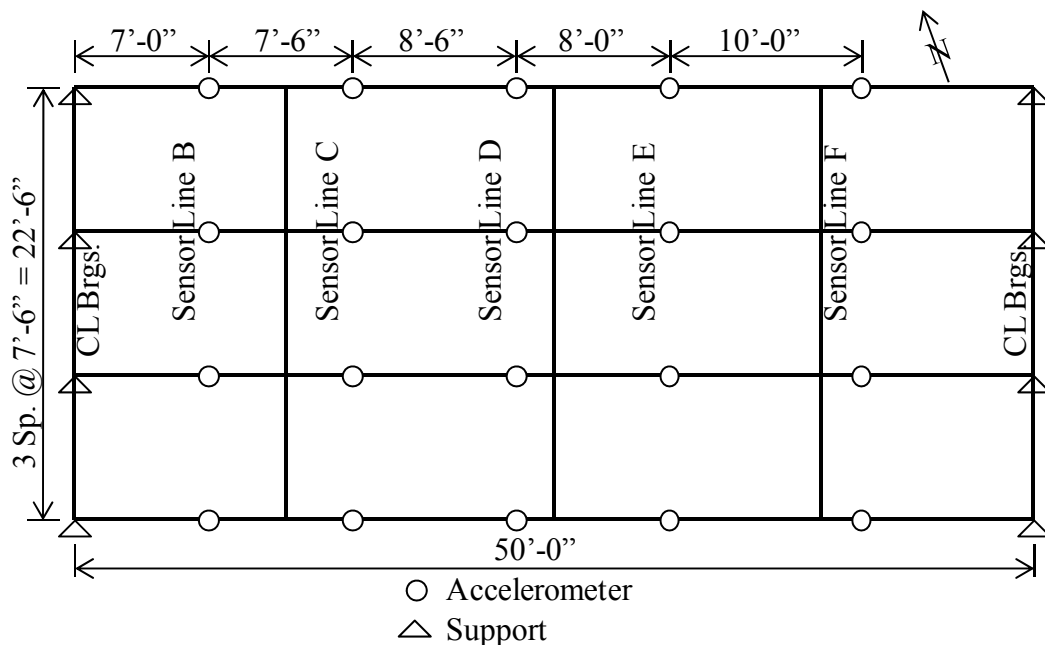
Spatial arrangement of accelerometers shown on bridge framing plan.
